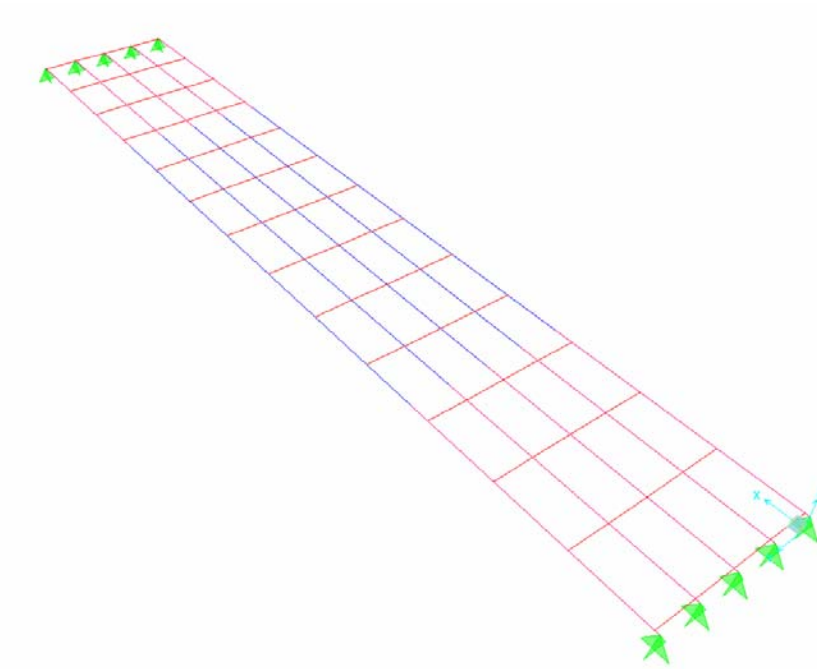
Two-Dimensional Grillage Model of Eno River Bridge
